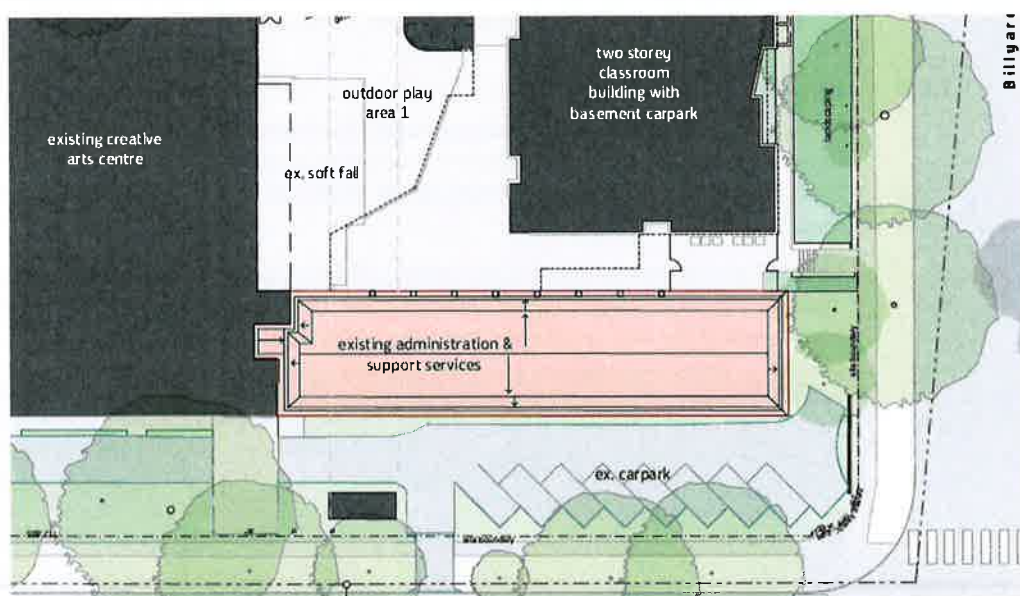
Excerpt of site plan showing existing school blocks/buildings in relation to the proposed development area.
